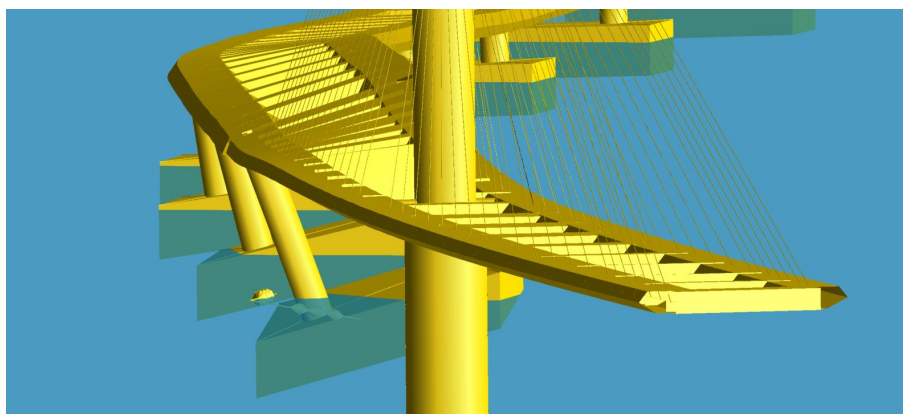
Deformation of bridge after 27.2 seconds, showing the twisting og the bridge girder developping into at more global mode. Deformations scaled by a factor of 5
